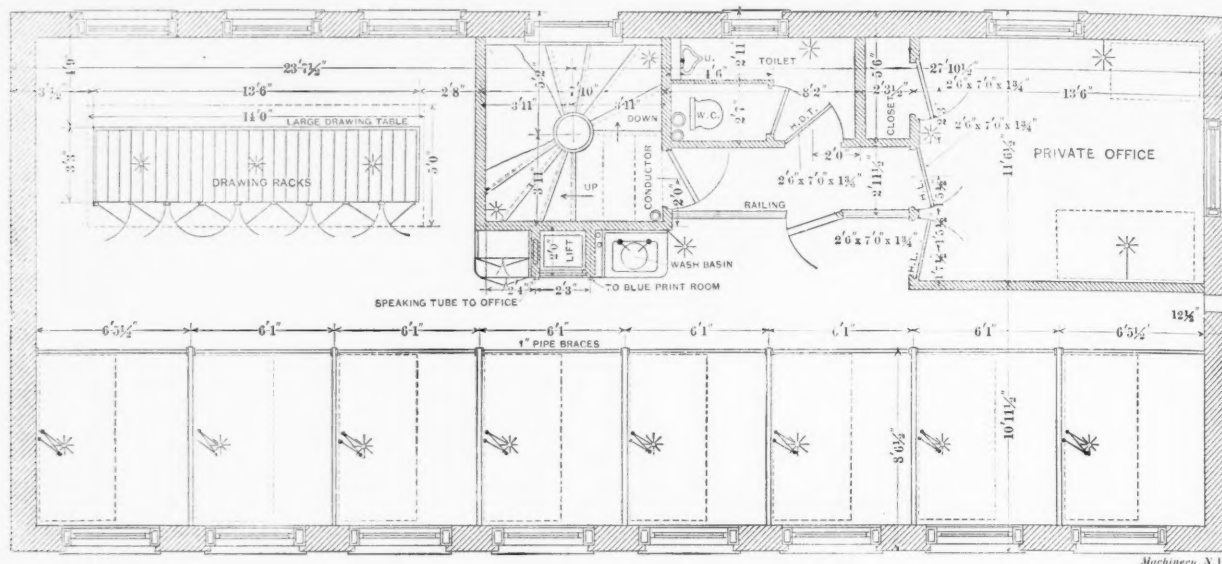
FLOOR PLAN OF THE DRAFTING ROOM.
